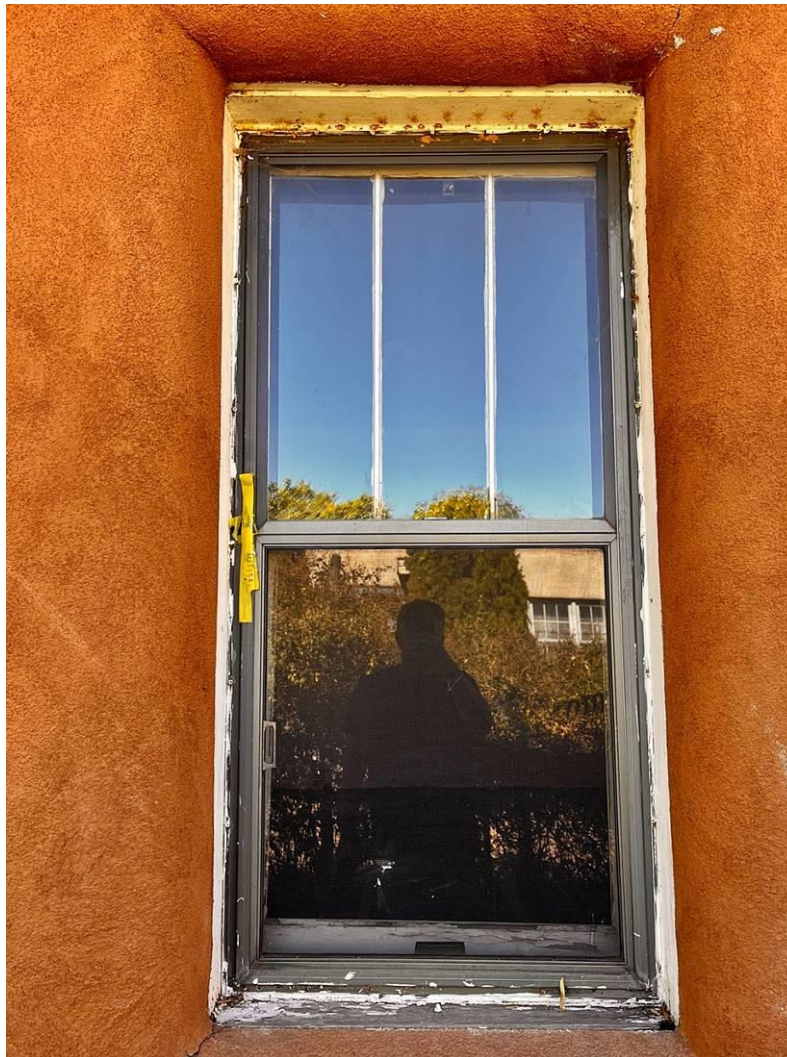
North elevation, Bedroom Wing, window. Camera facing south.
